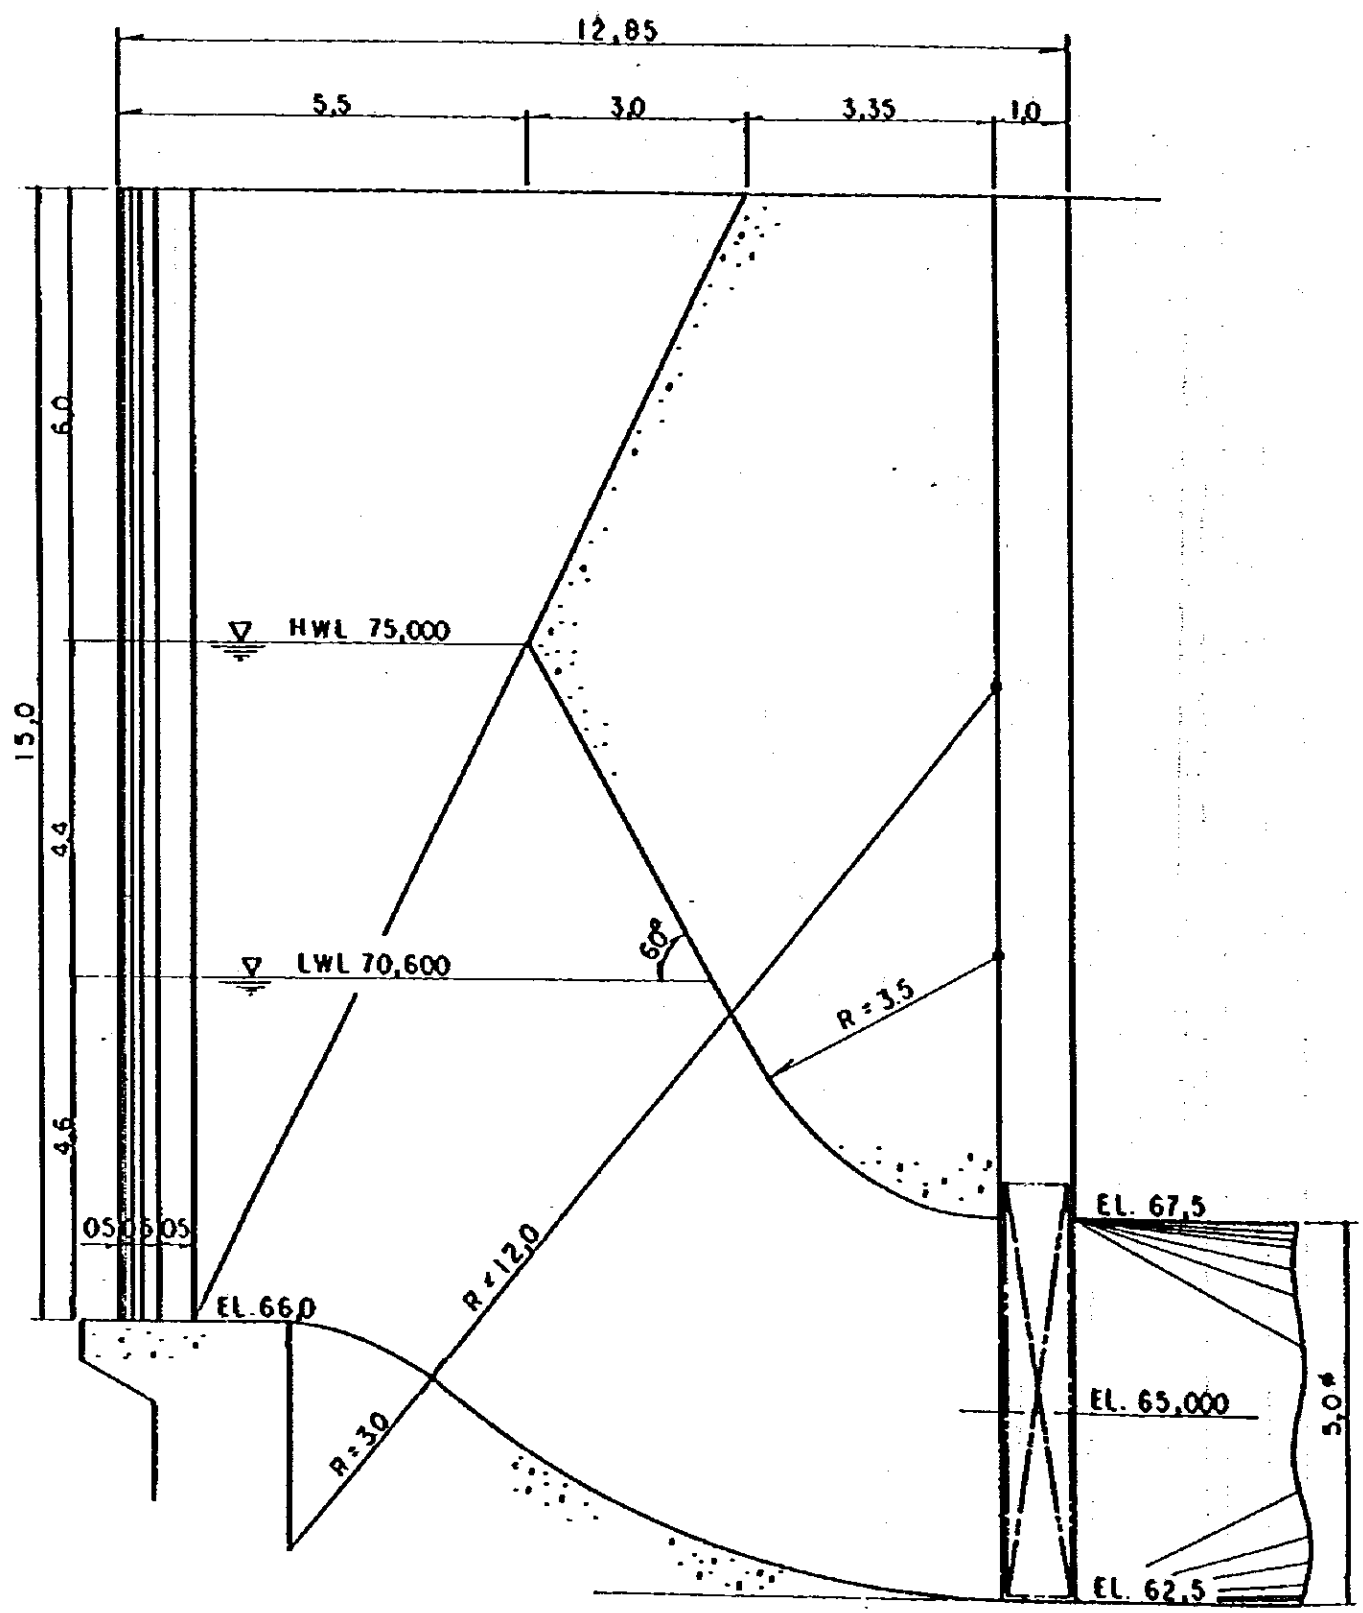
Plan of Intake Model (Lower Tekai Dam)
